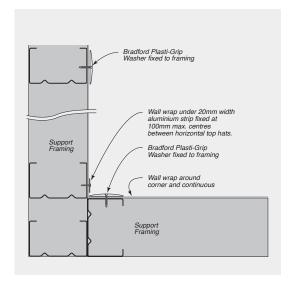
Internal Corner - Wall Wrap Overlapped
